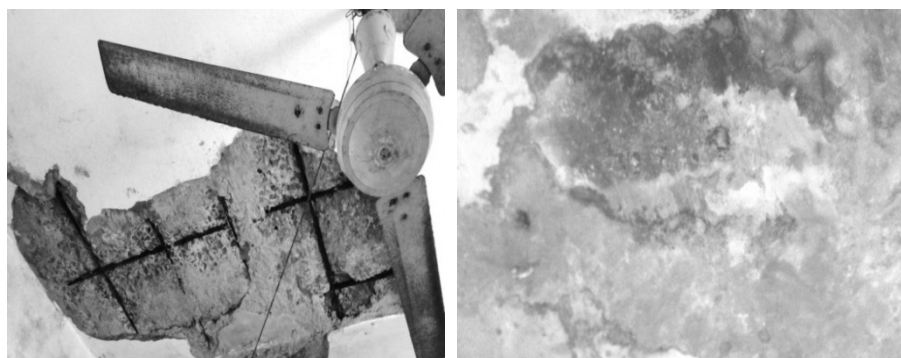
Existing Roof Slab Condition of Dr. M. A. Rashid Hall
